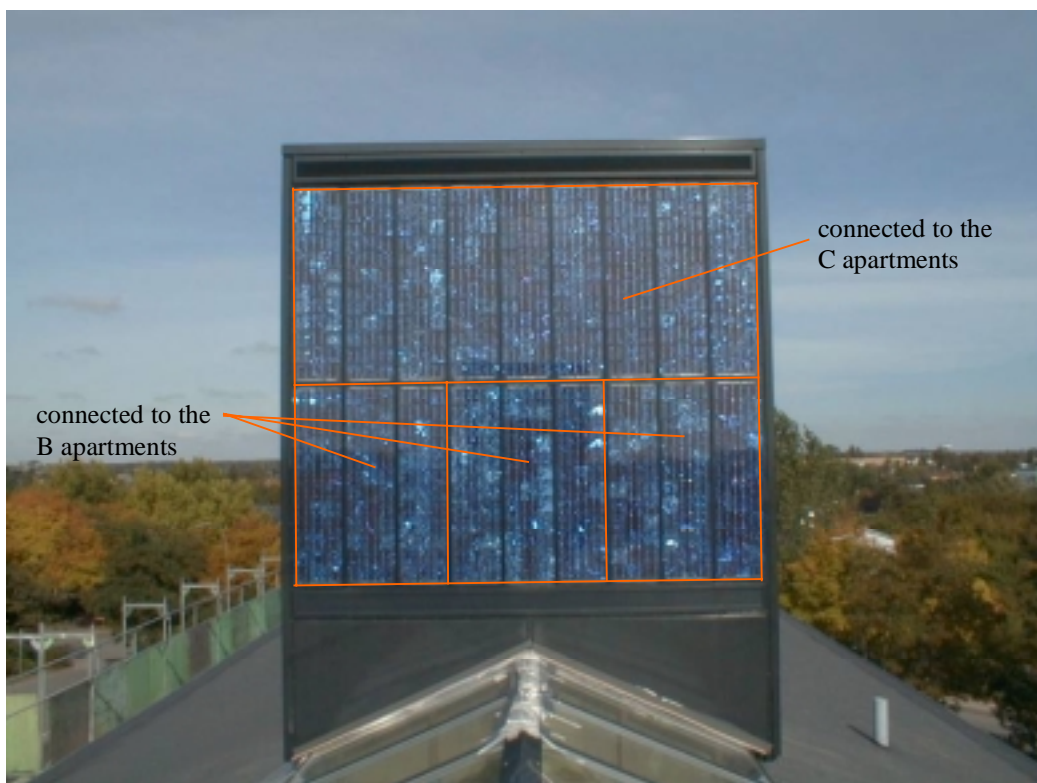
The electrical connection of the PV-panels at the solar ventilation chimney of no. 40.
